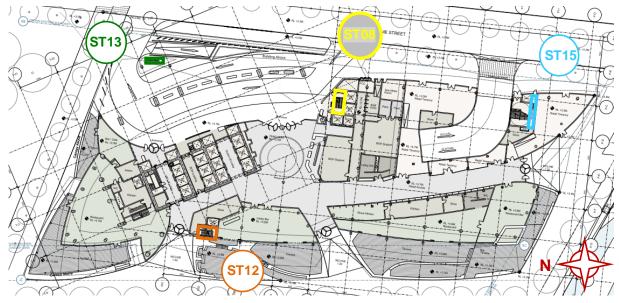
Ground floor (L0) plan indicating discharge of exits from the basement.
